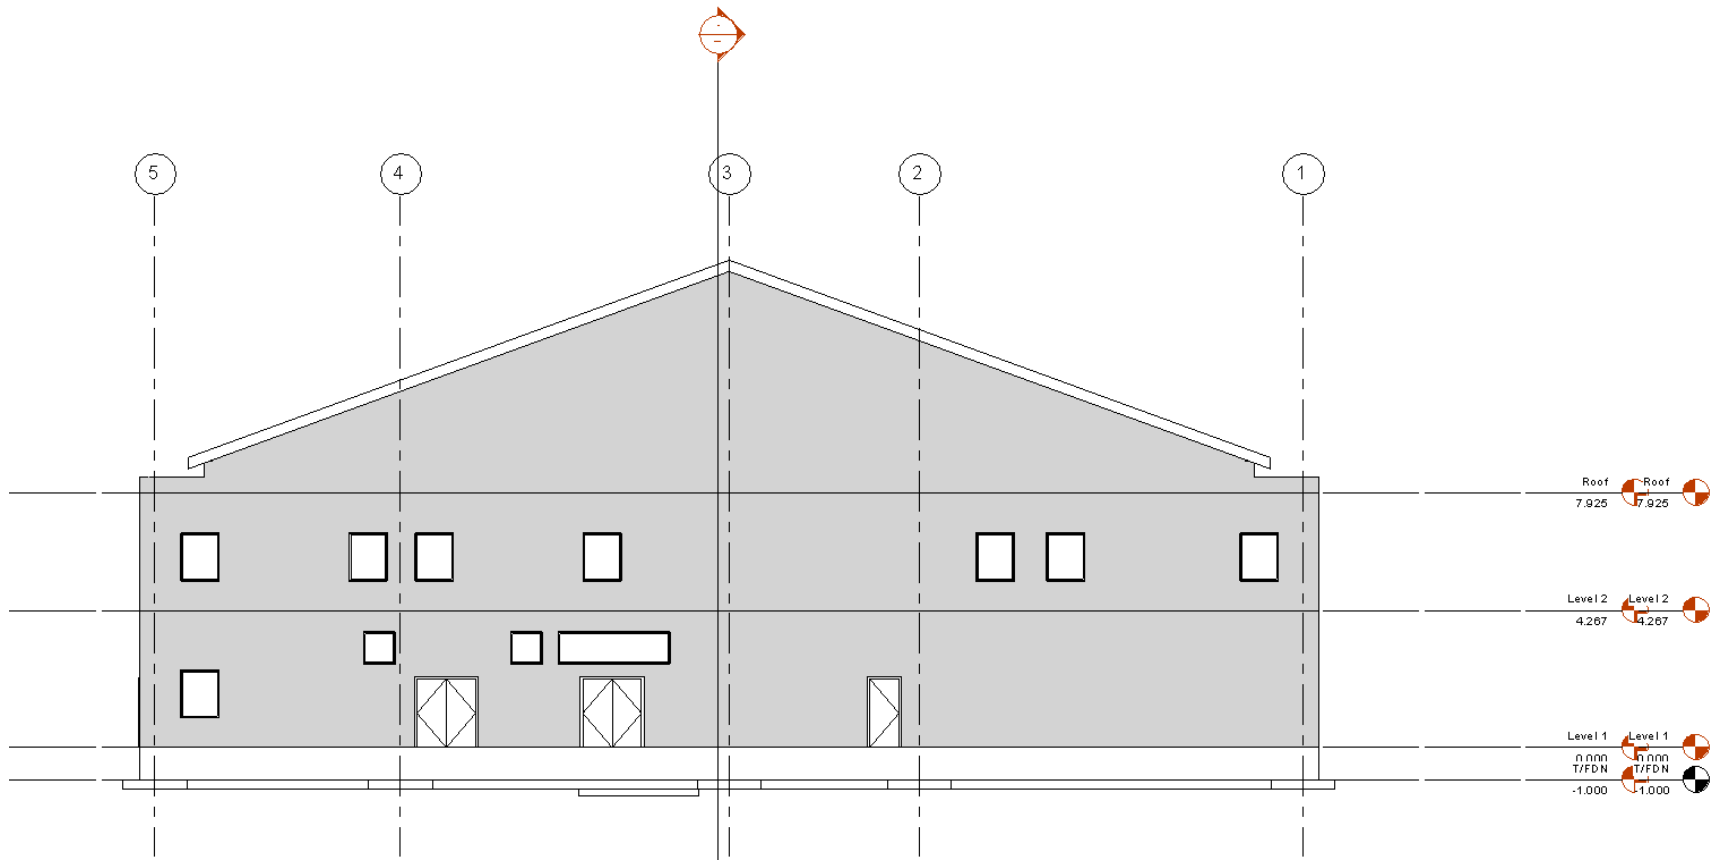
Scaled sample elevation view of a project (Standard office project Revit file from National Building Information Model Standard)
